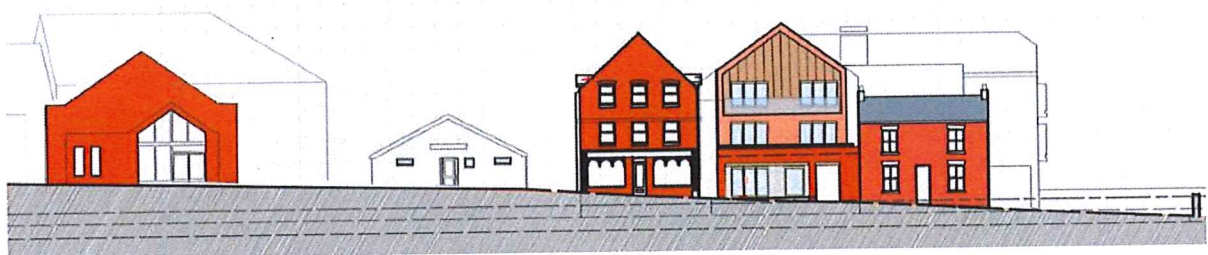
New Elevation inserted between listed New Market House & Gavel House takes its geometry from existing street elevations
